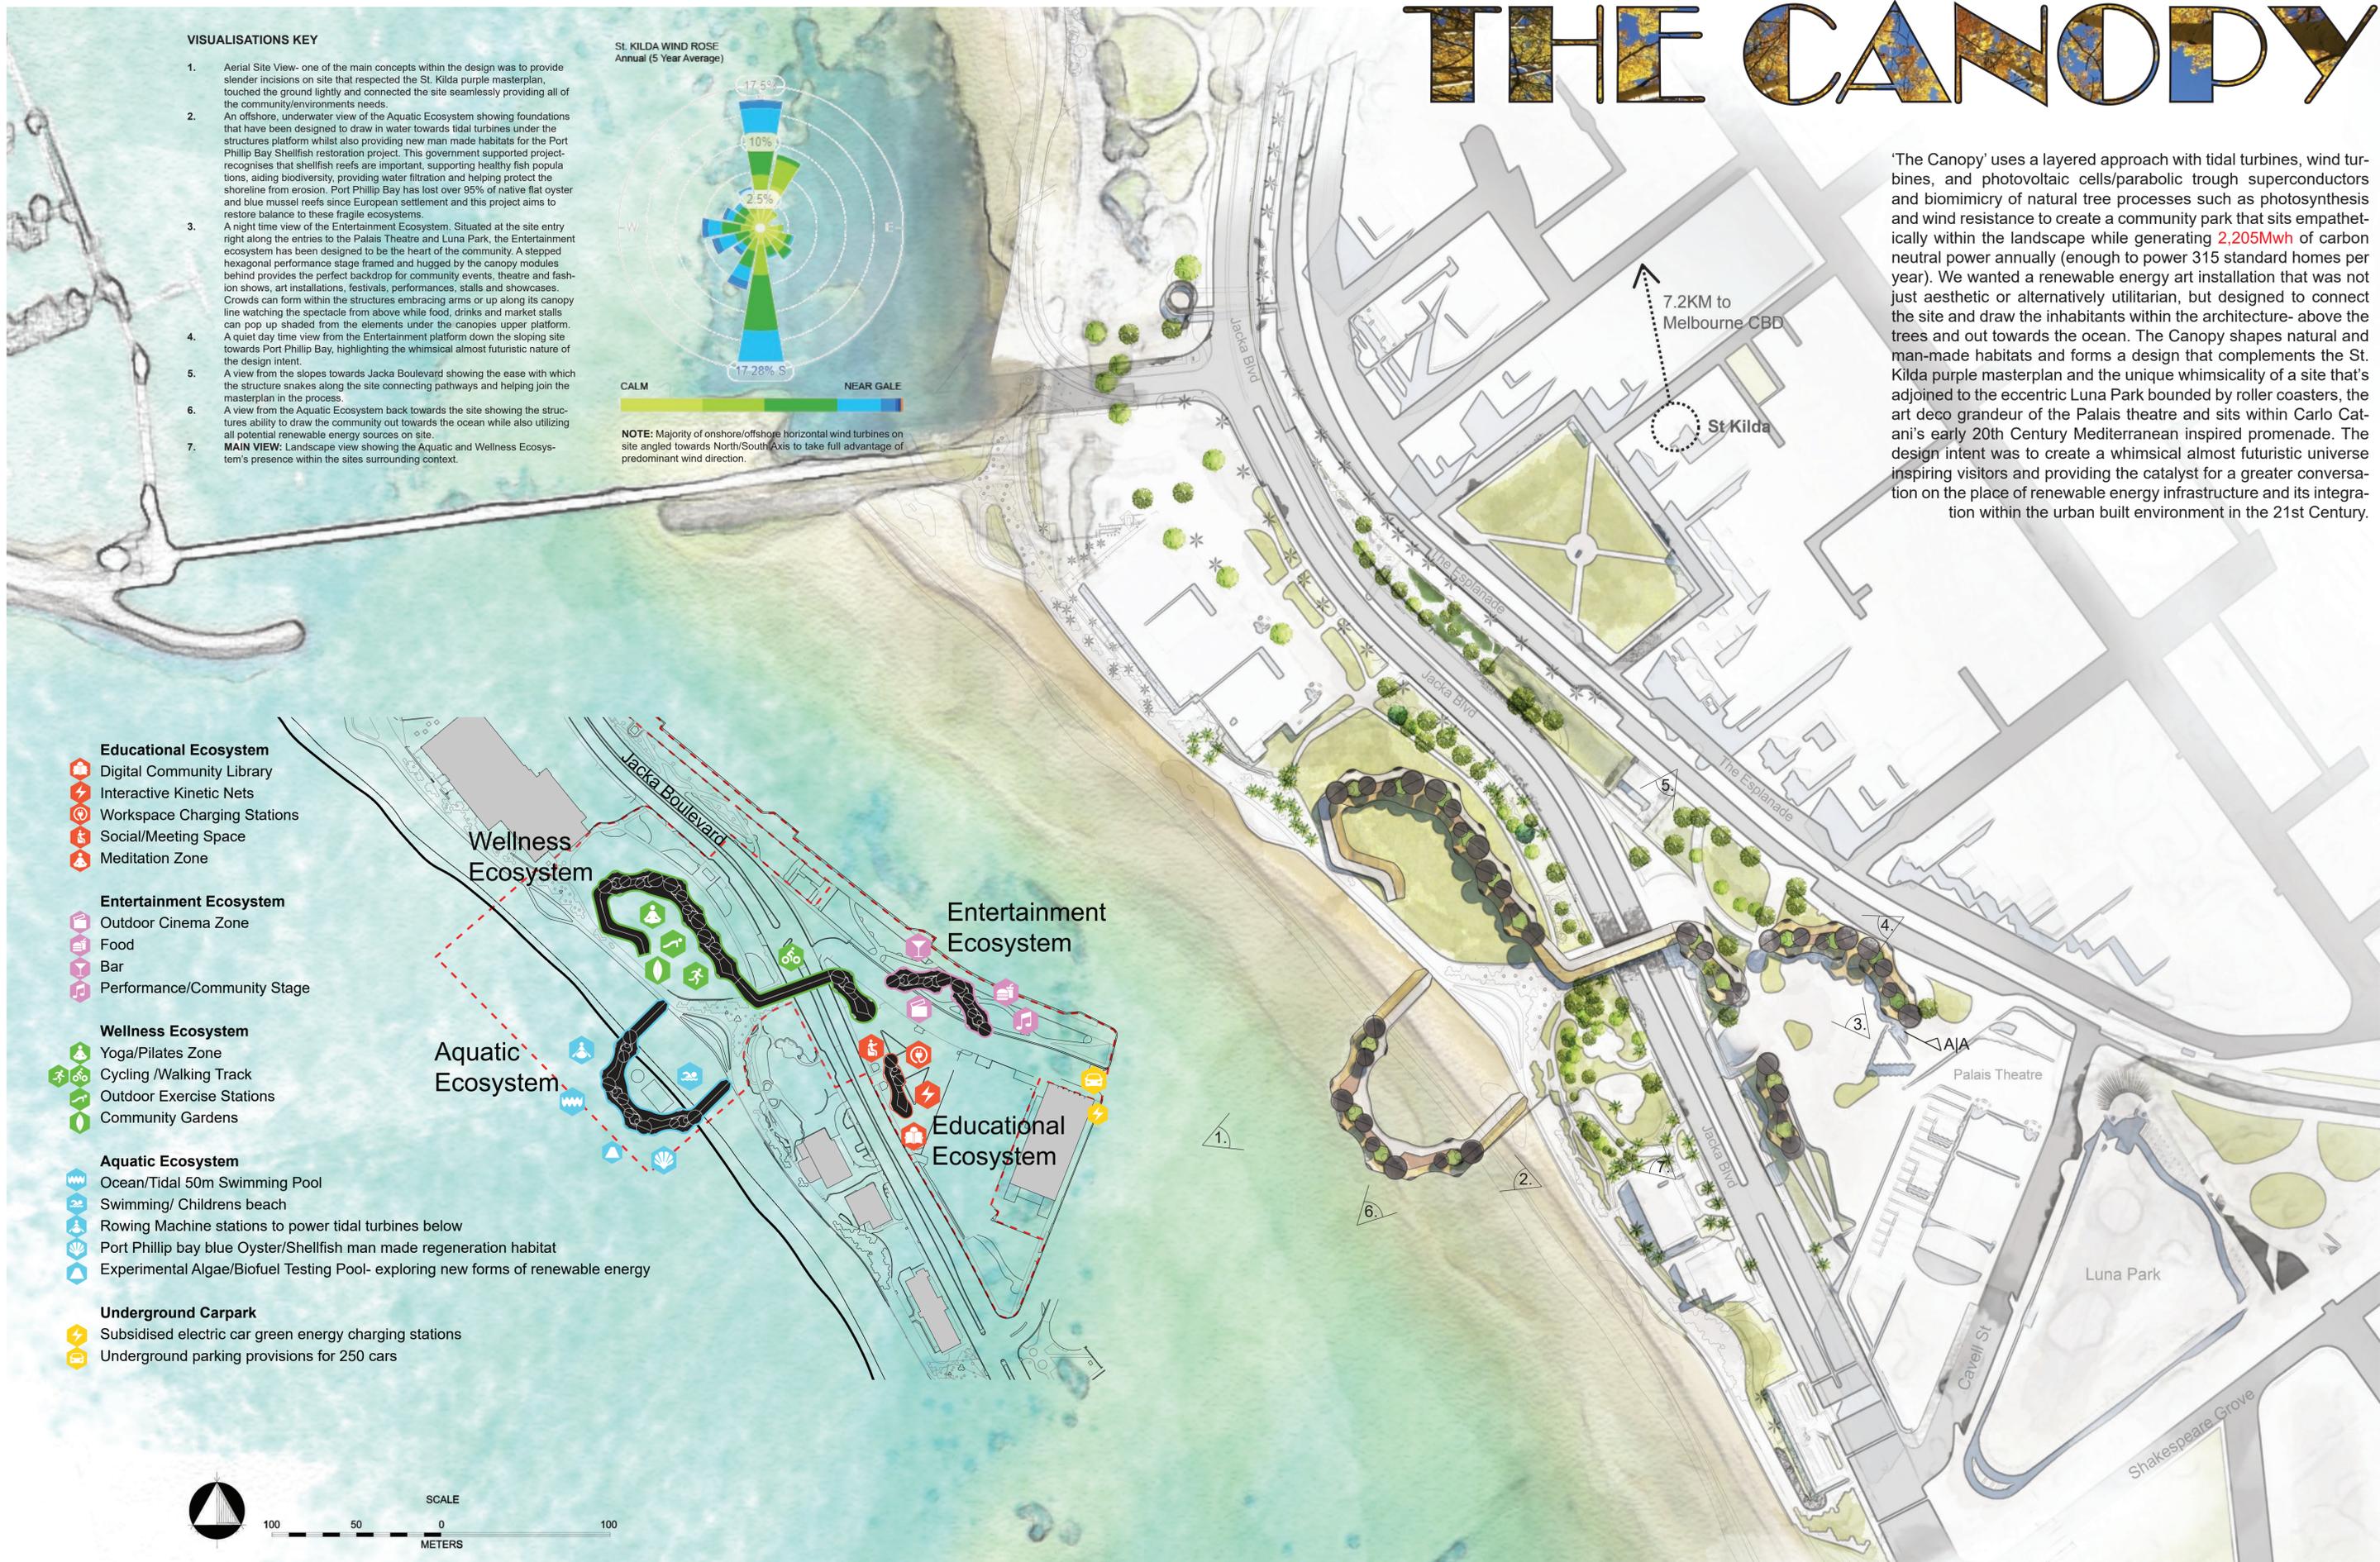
FIGURE: ST. KILDA FORESHORE SITE PLAN
